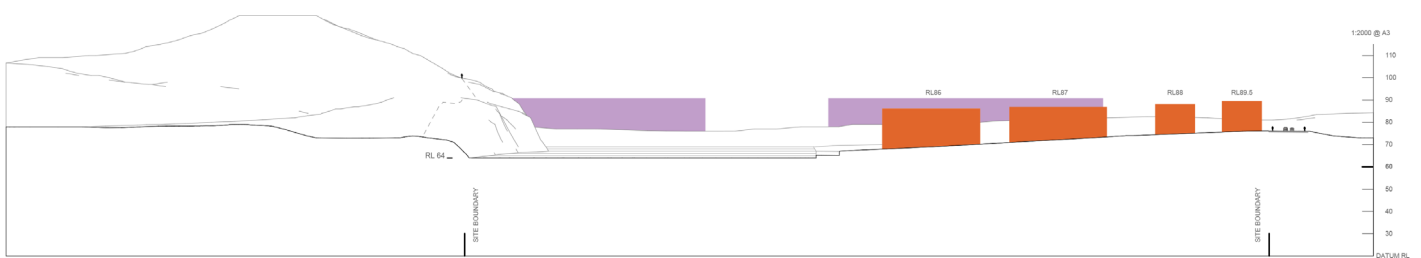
RRA Development Plan – Proposed Zoning (west-east cross-section)
